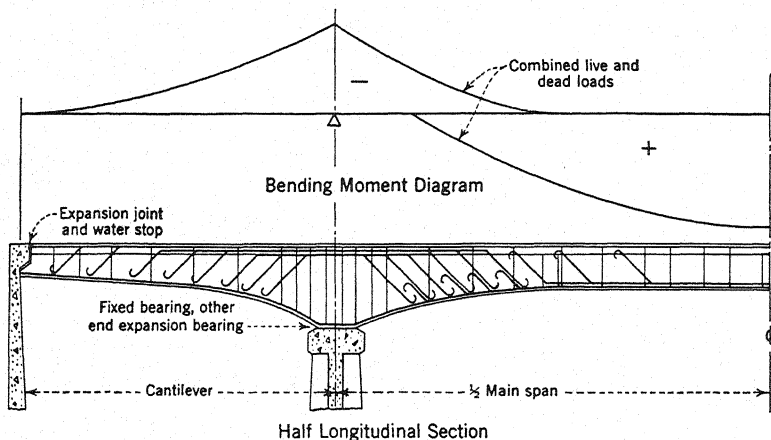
Girder with Two Cantilevers. Details of Reinforcement. (See p. 123.)
